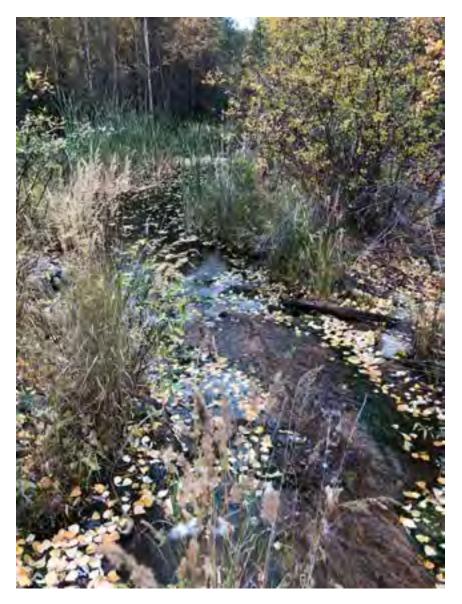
Marie Reservoir Spillway looking downstream at stilling basin (September 2018)
